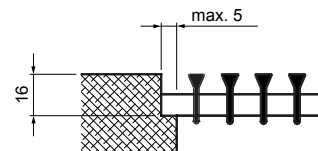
The NOVA-S grille mounting directly into a window sill opening
